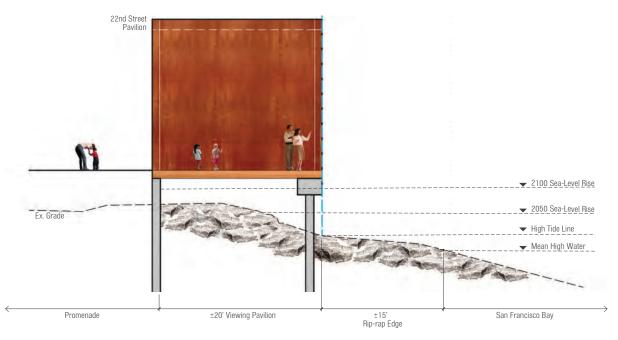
Illustrative Shoreline Section 3 Note: All dimensions and elevations are illustrative only.
